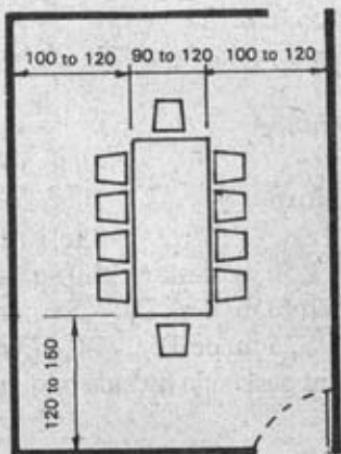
PLAN OF A PRIVATE OFFICE CONFERENCE ROOM
